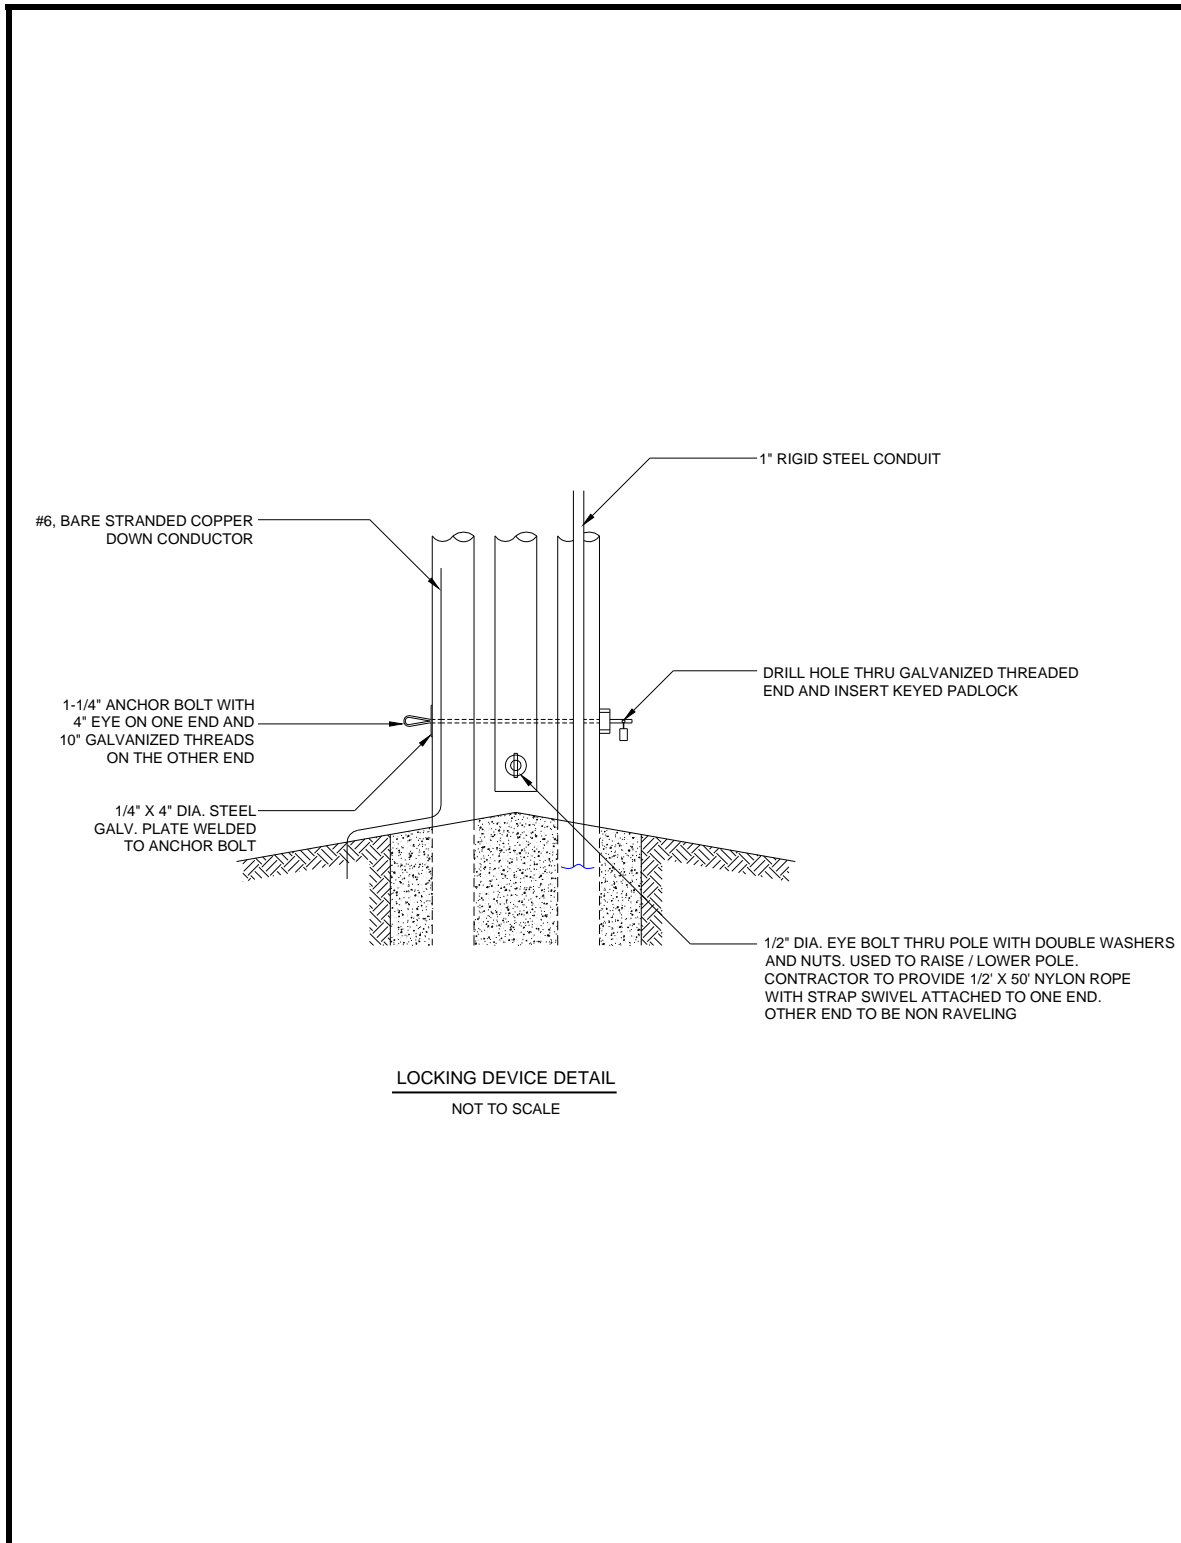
Standard Details for Pivoting Rotating Beacon Pole – Locking Device Detail.
